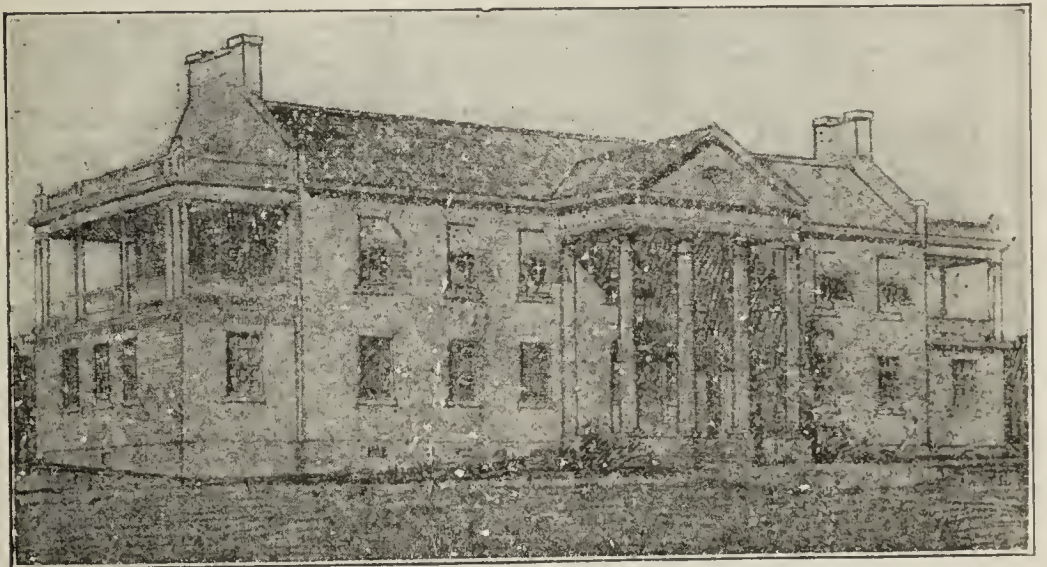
Front view of building (from architect's drawing): Exterior walls are of red brick with roof of red tile; exterior woodwork is painted white; the colonial style is especially adapted to this building, because of its prominent site and spacious grounds.
